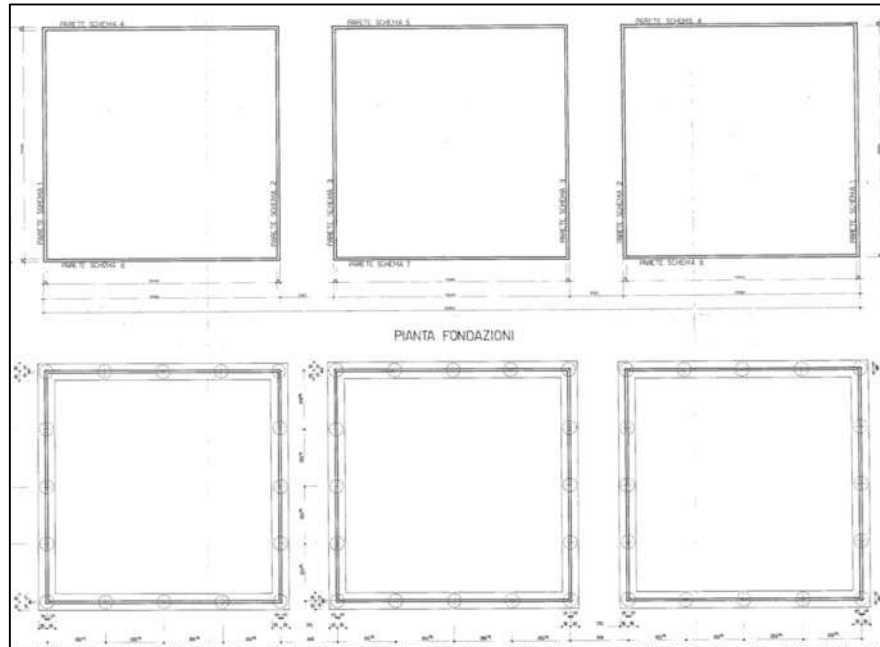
Foundation Plan Qa19-(F165.1 T9).
